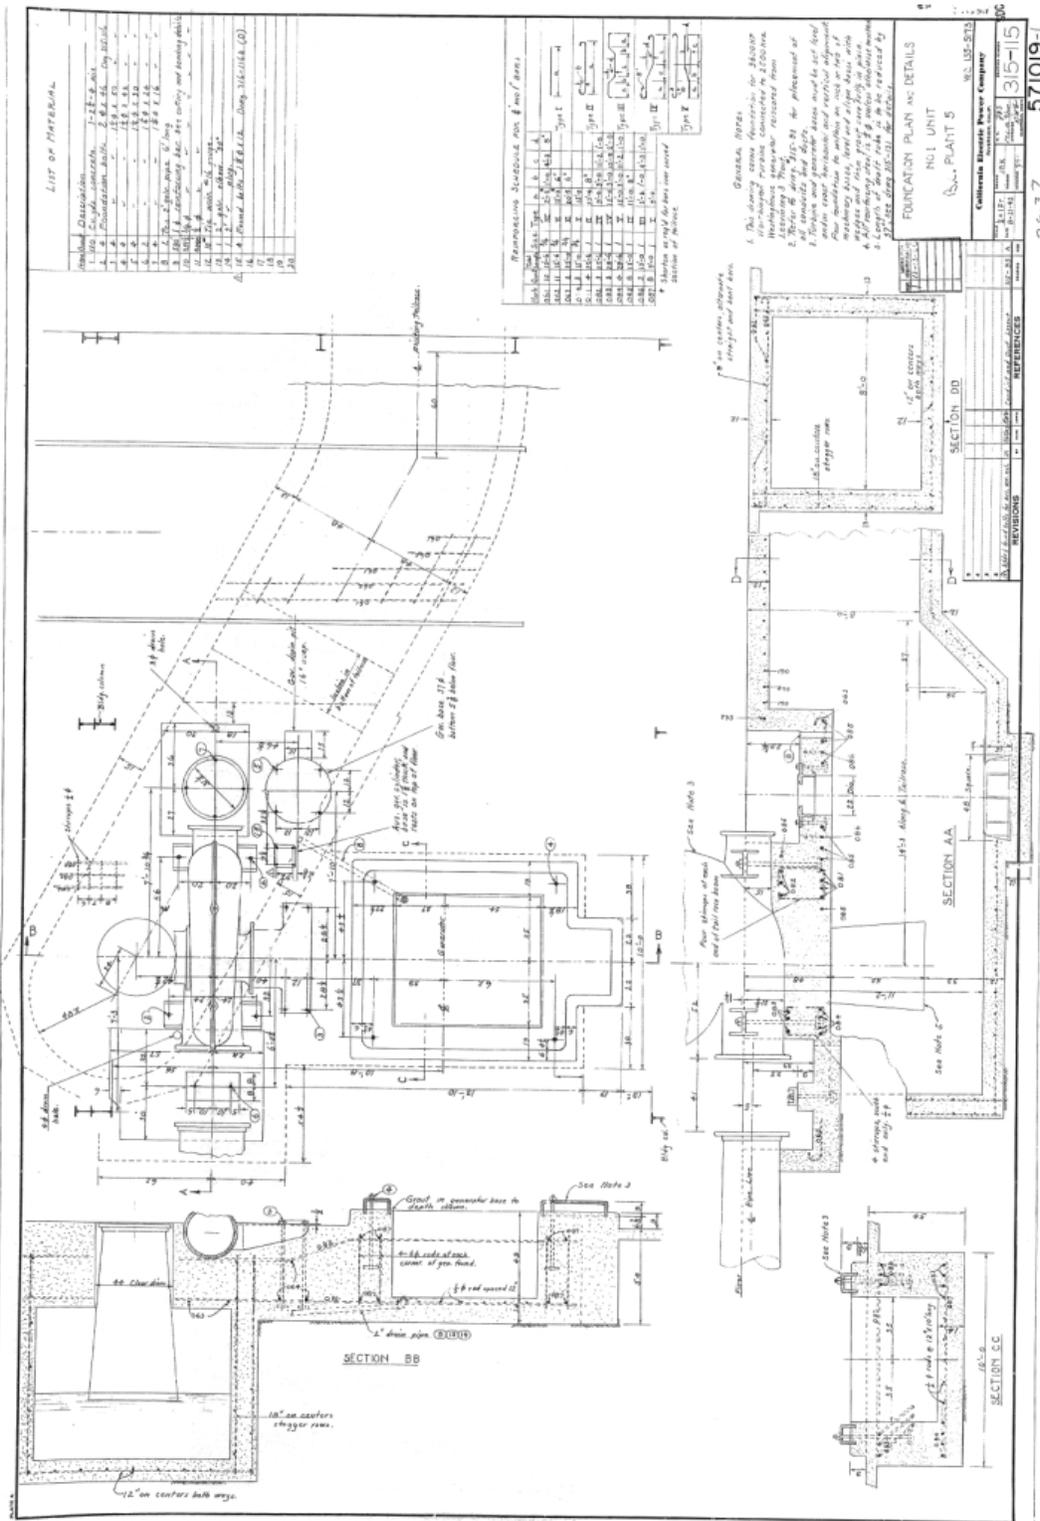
California Electric Power Company, "Foundation Plan and Details, No. 1 Unit Plant 5," August 21, 1942; revised January 15, 1943. SCE Drawing No. 571019-1.
